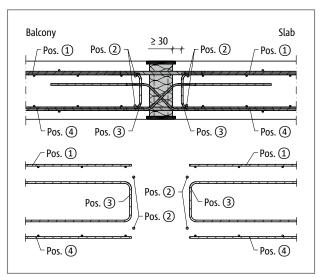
Schöck Isokorb® T type D: On-site reinforcement
